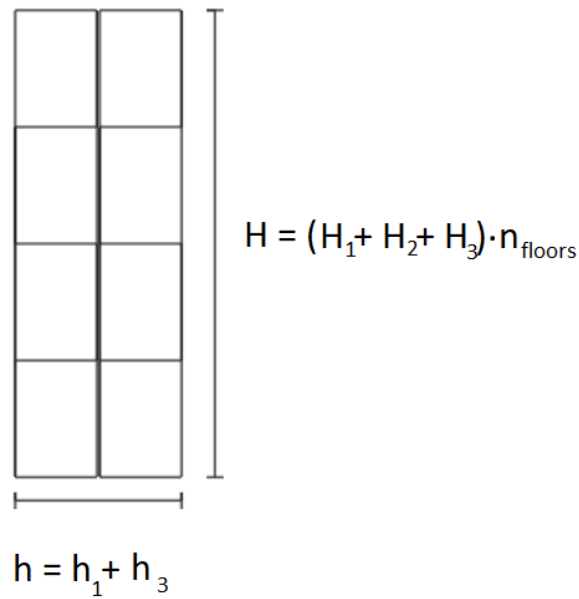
Example of removing the part of the wall with opening to take into account reduced stiffness.
